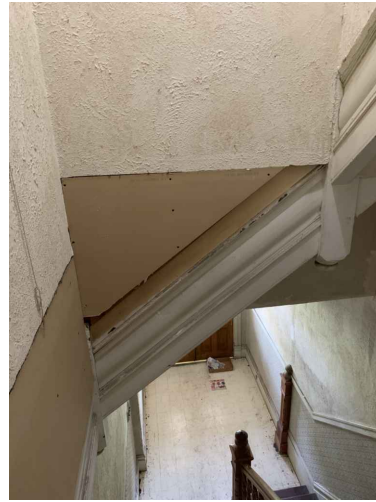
INTERIOR STAIRS ENCLOSED WITH WALLS
